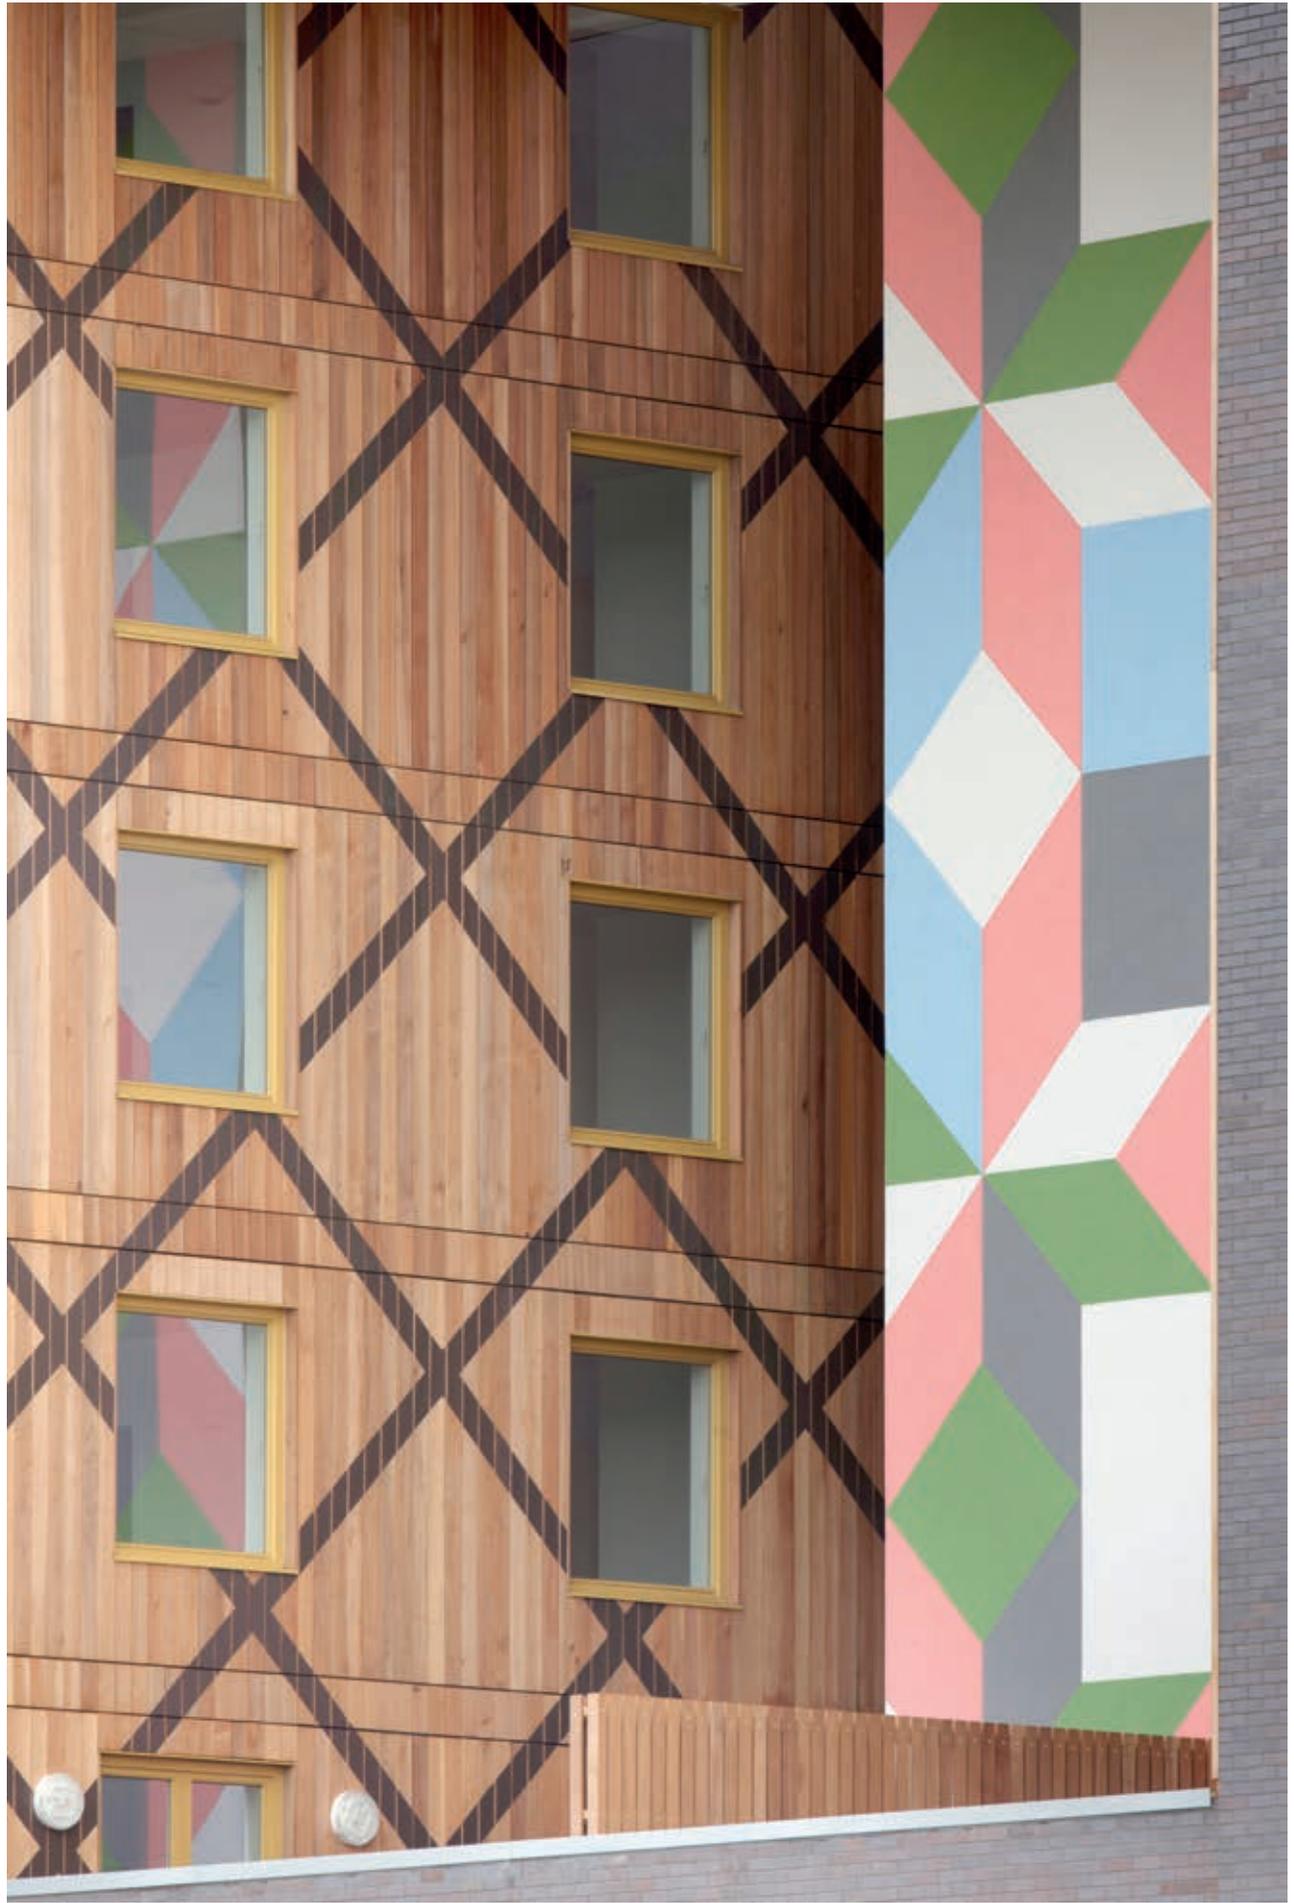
Timber cladding detail 3, photograph Rob Parrish
